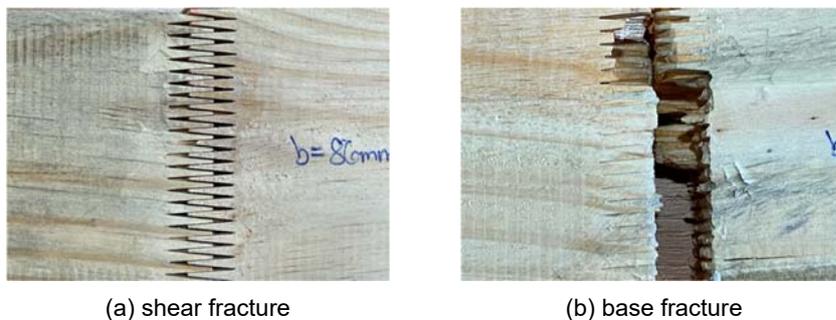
Fracture modes of the finger joints tested in bending (Simon Kramer)
